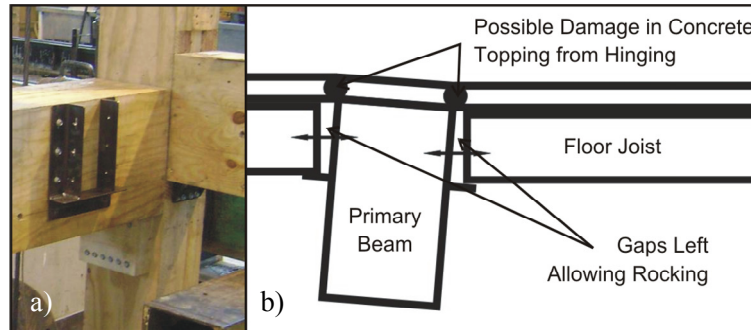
a) Joist hanger and b) movement during beam-column rocking (Smith 2008)
